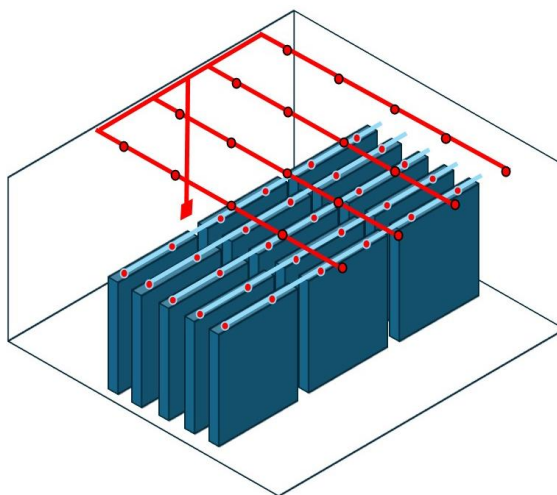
Warehouse Scheme 3 - Ceiling detection plus top of rack detection
